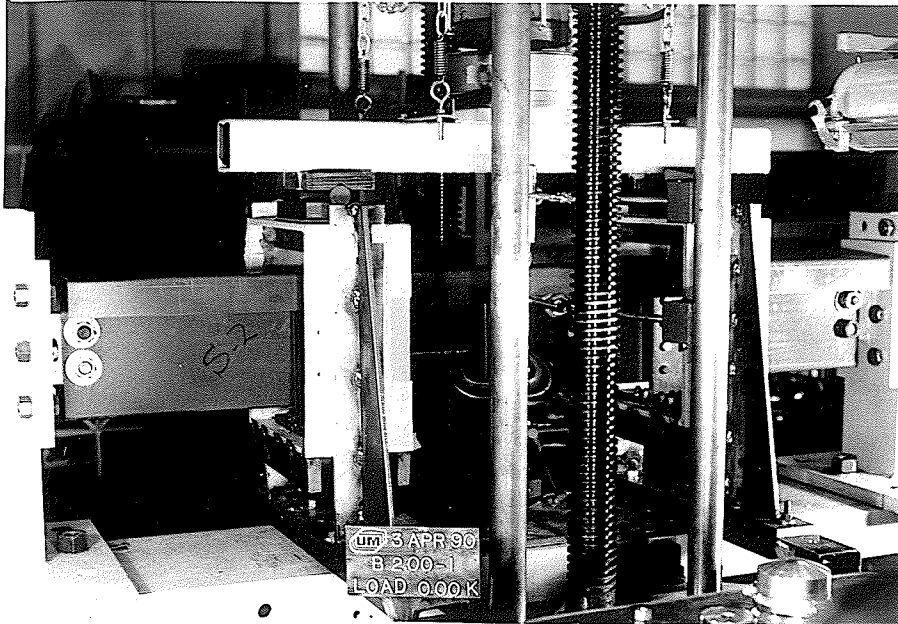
The Test Set-Up for a Typical Beam Specimen
